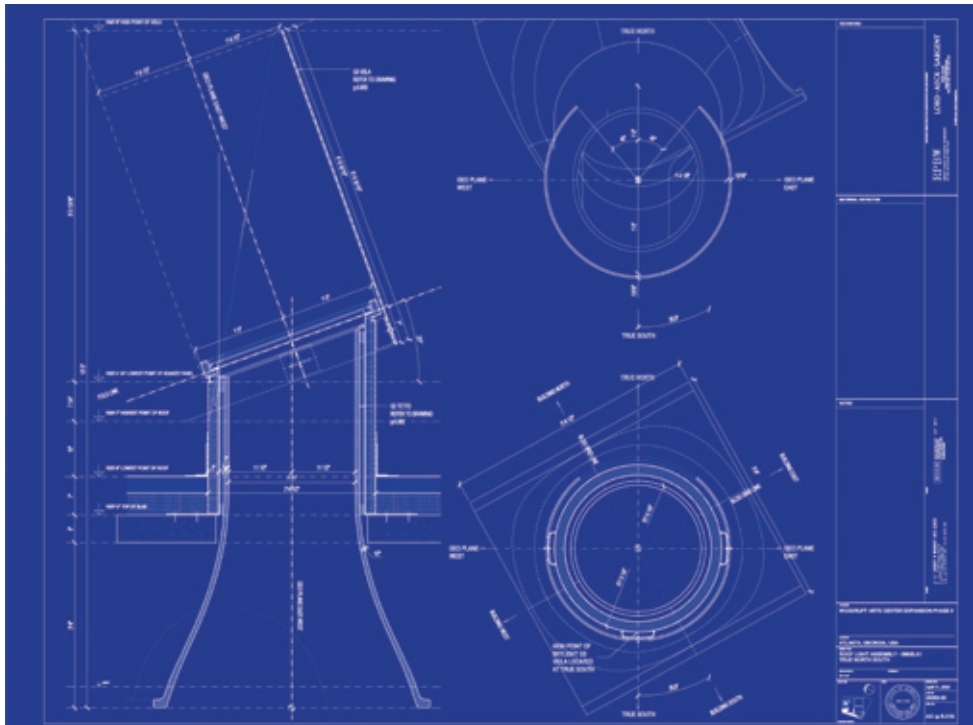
RPBW's working drawing of a sun cowl and rooflight assembly
